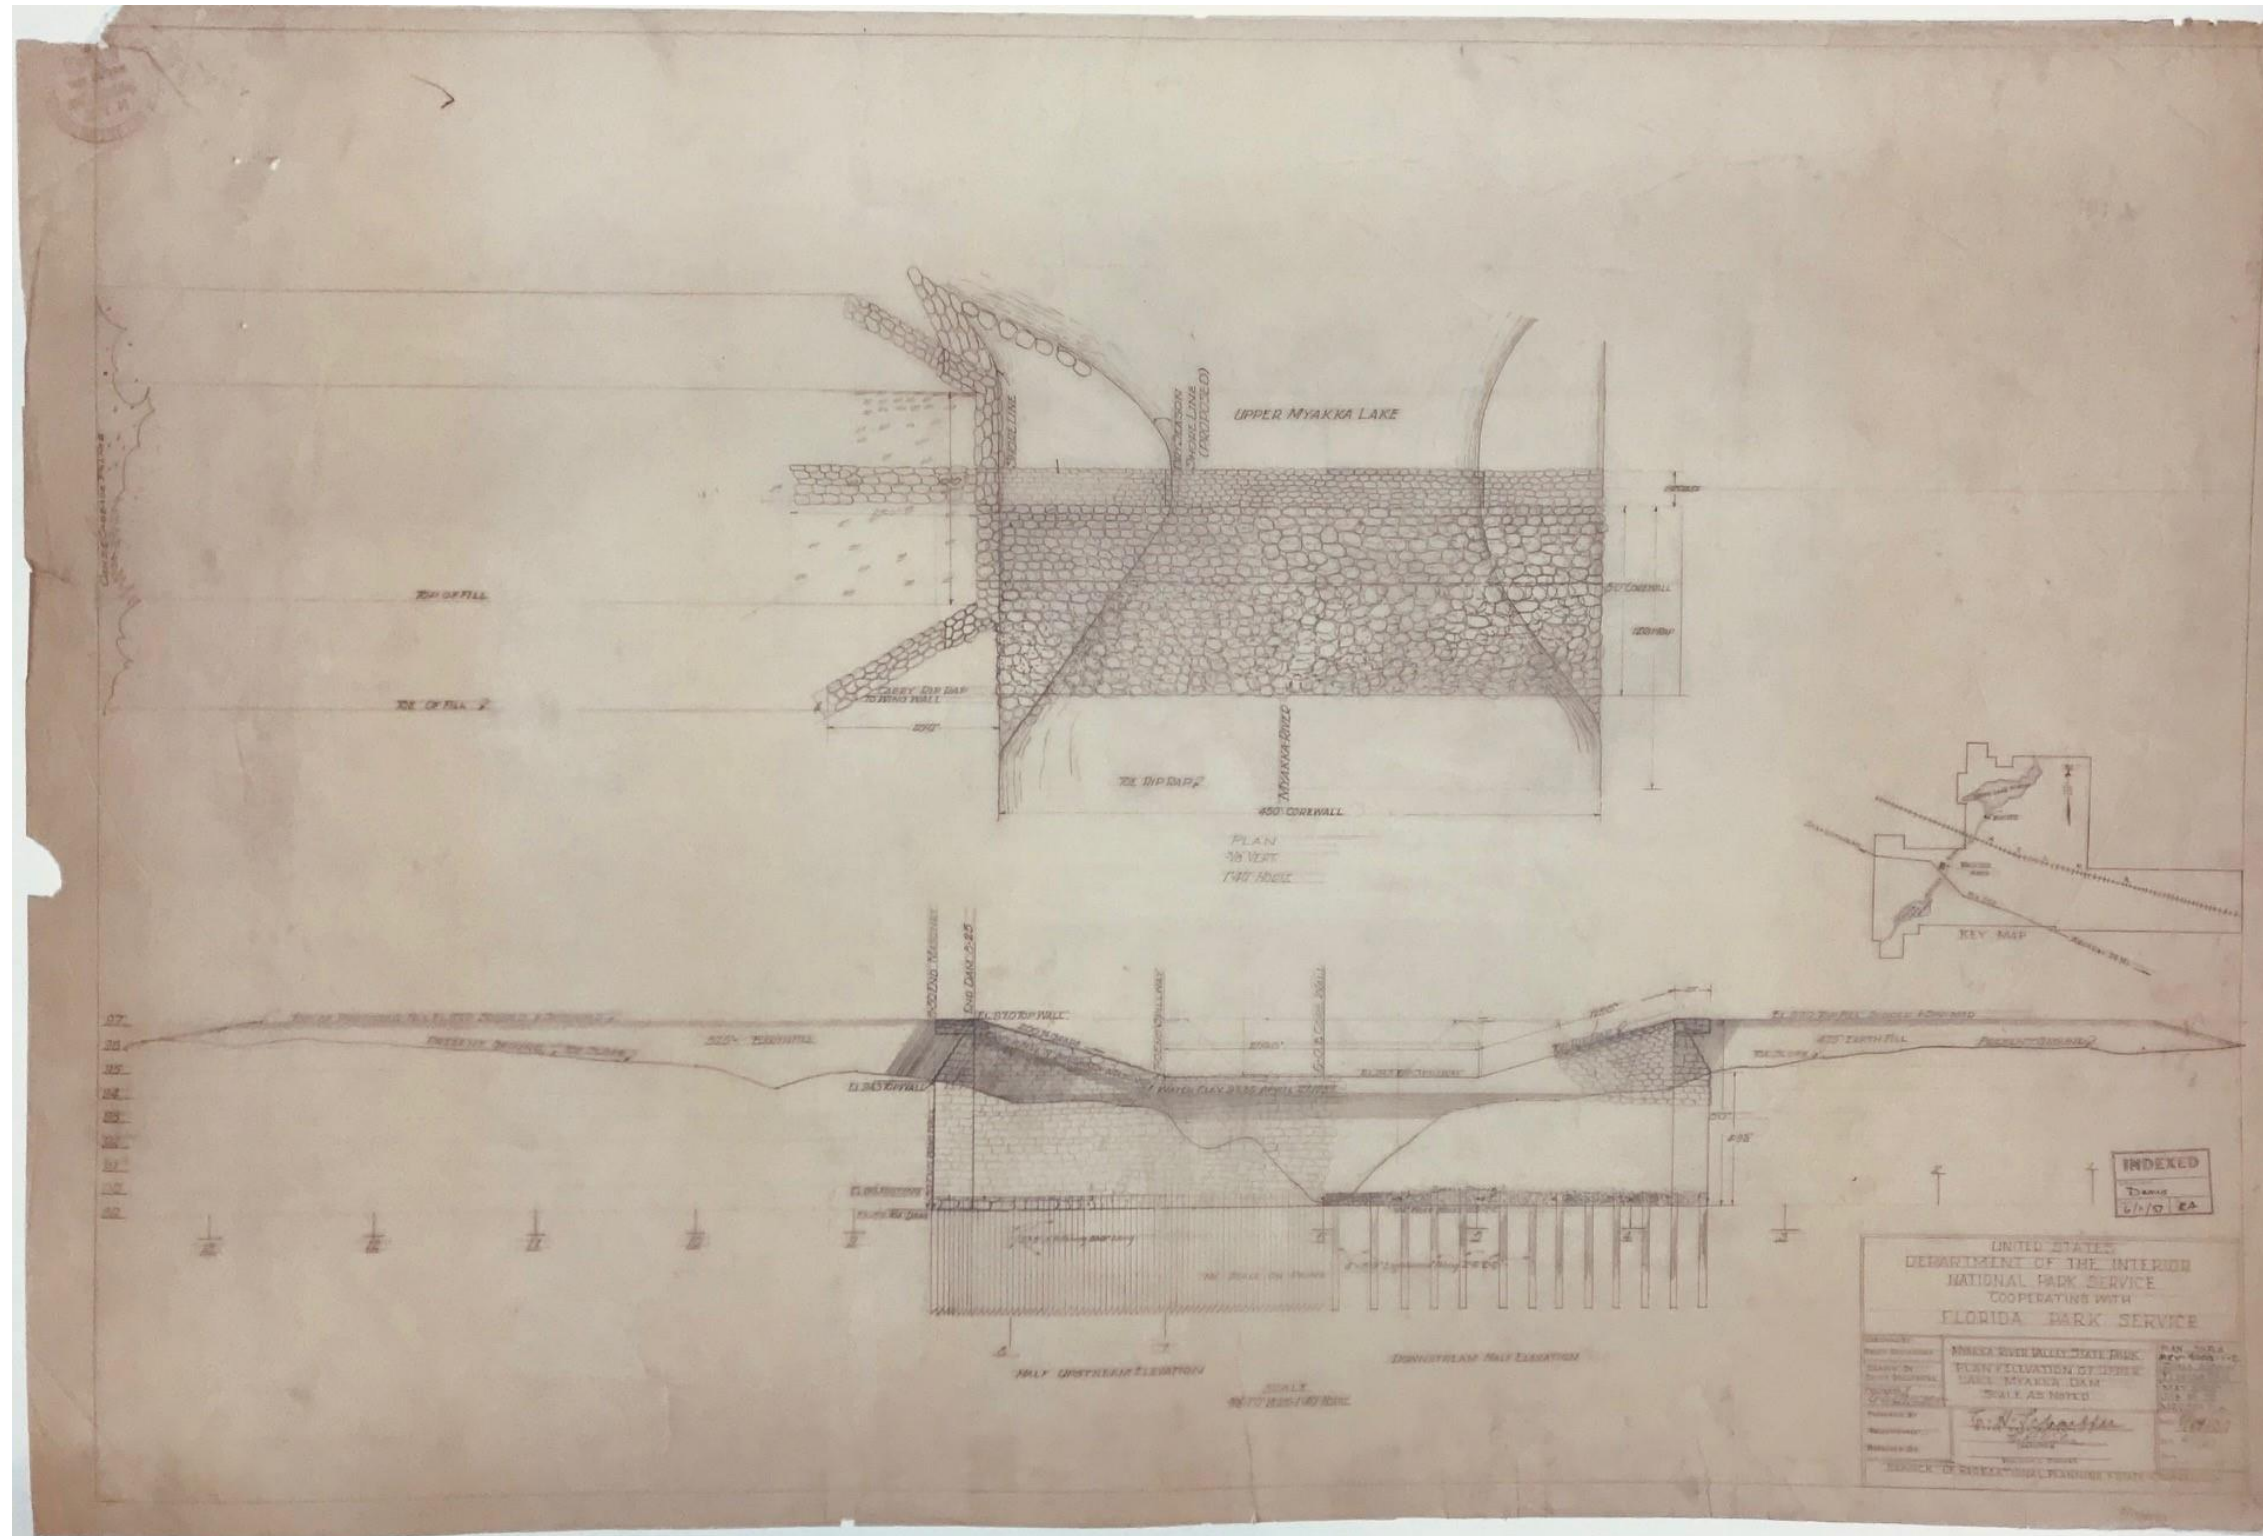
Detailed plans from 1937 original design of the Upper Myakka Dam (8502273) on the Upper Myakka Lake, showing plan and elevation.
